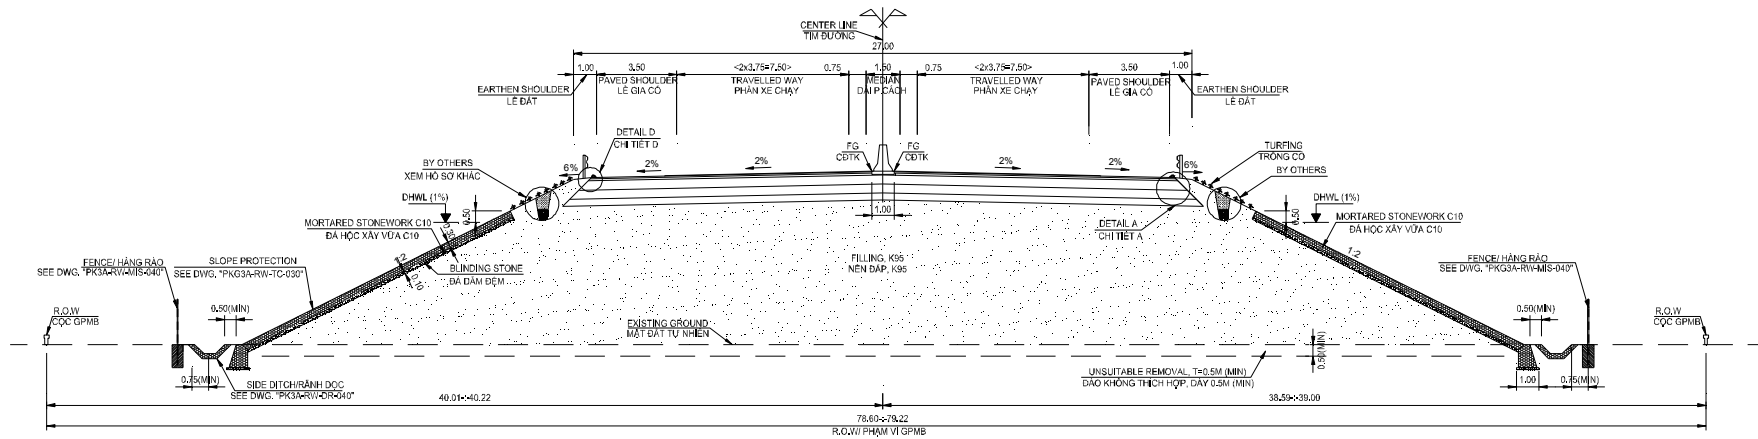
(b) Typical Cross Section of Bridge Approach (KM16+970.4-KM16+980.4)
